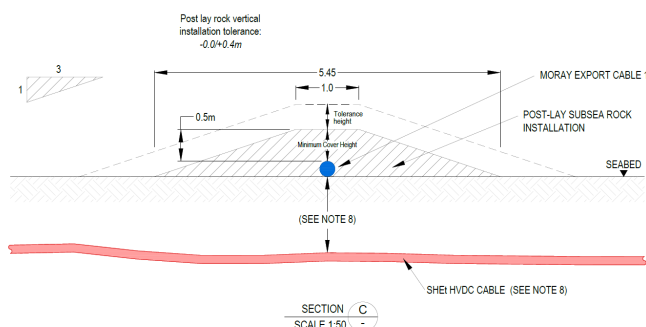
Indicative cable crossing arrangement (profile view) of OEC 1 and SHET HVDC cable.
